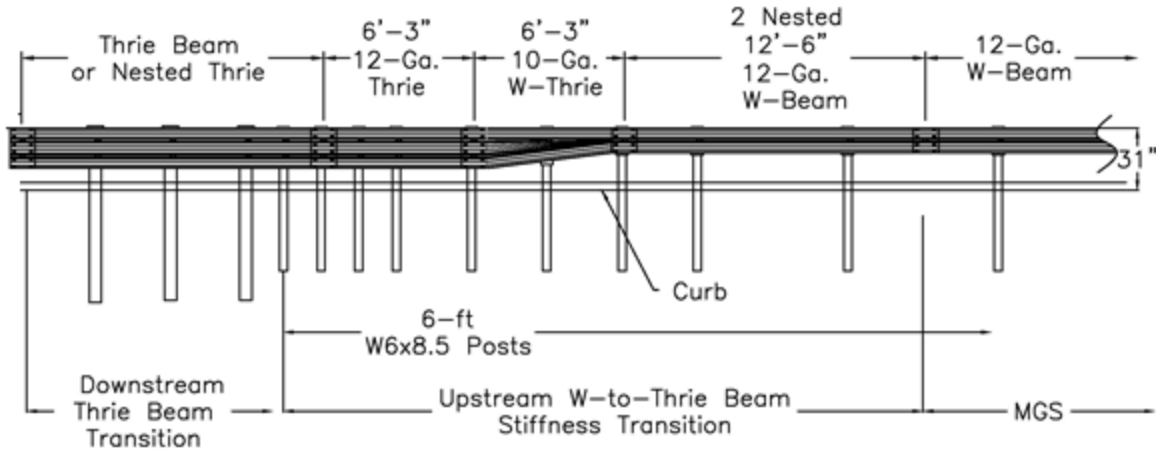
Nested W-beam Upstream from W-to-Thrie Segment for Curbed Installations
